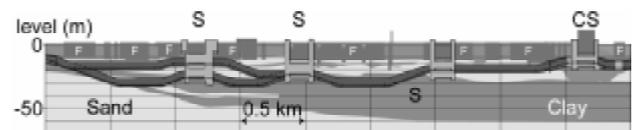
North South line bored tunnel alignment. S are the planned metro stations, CS is the existing train station and F indicates existing pile foundations adjacent to the trace.
